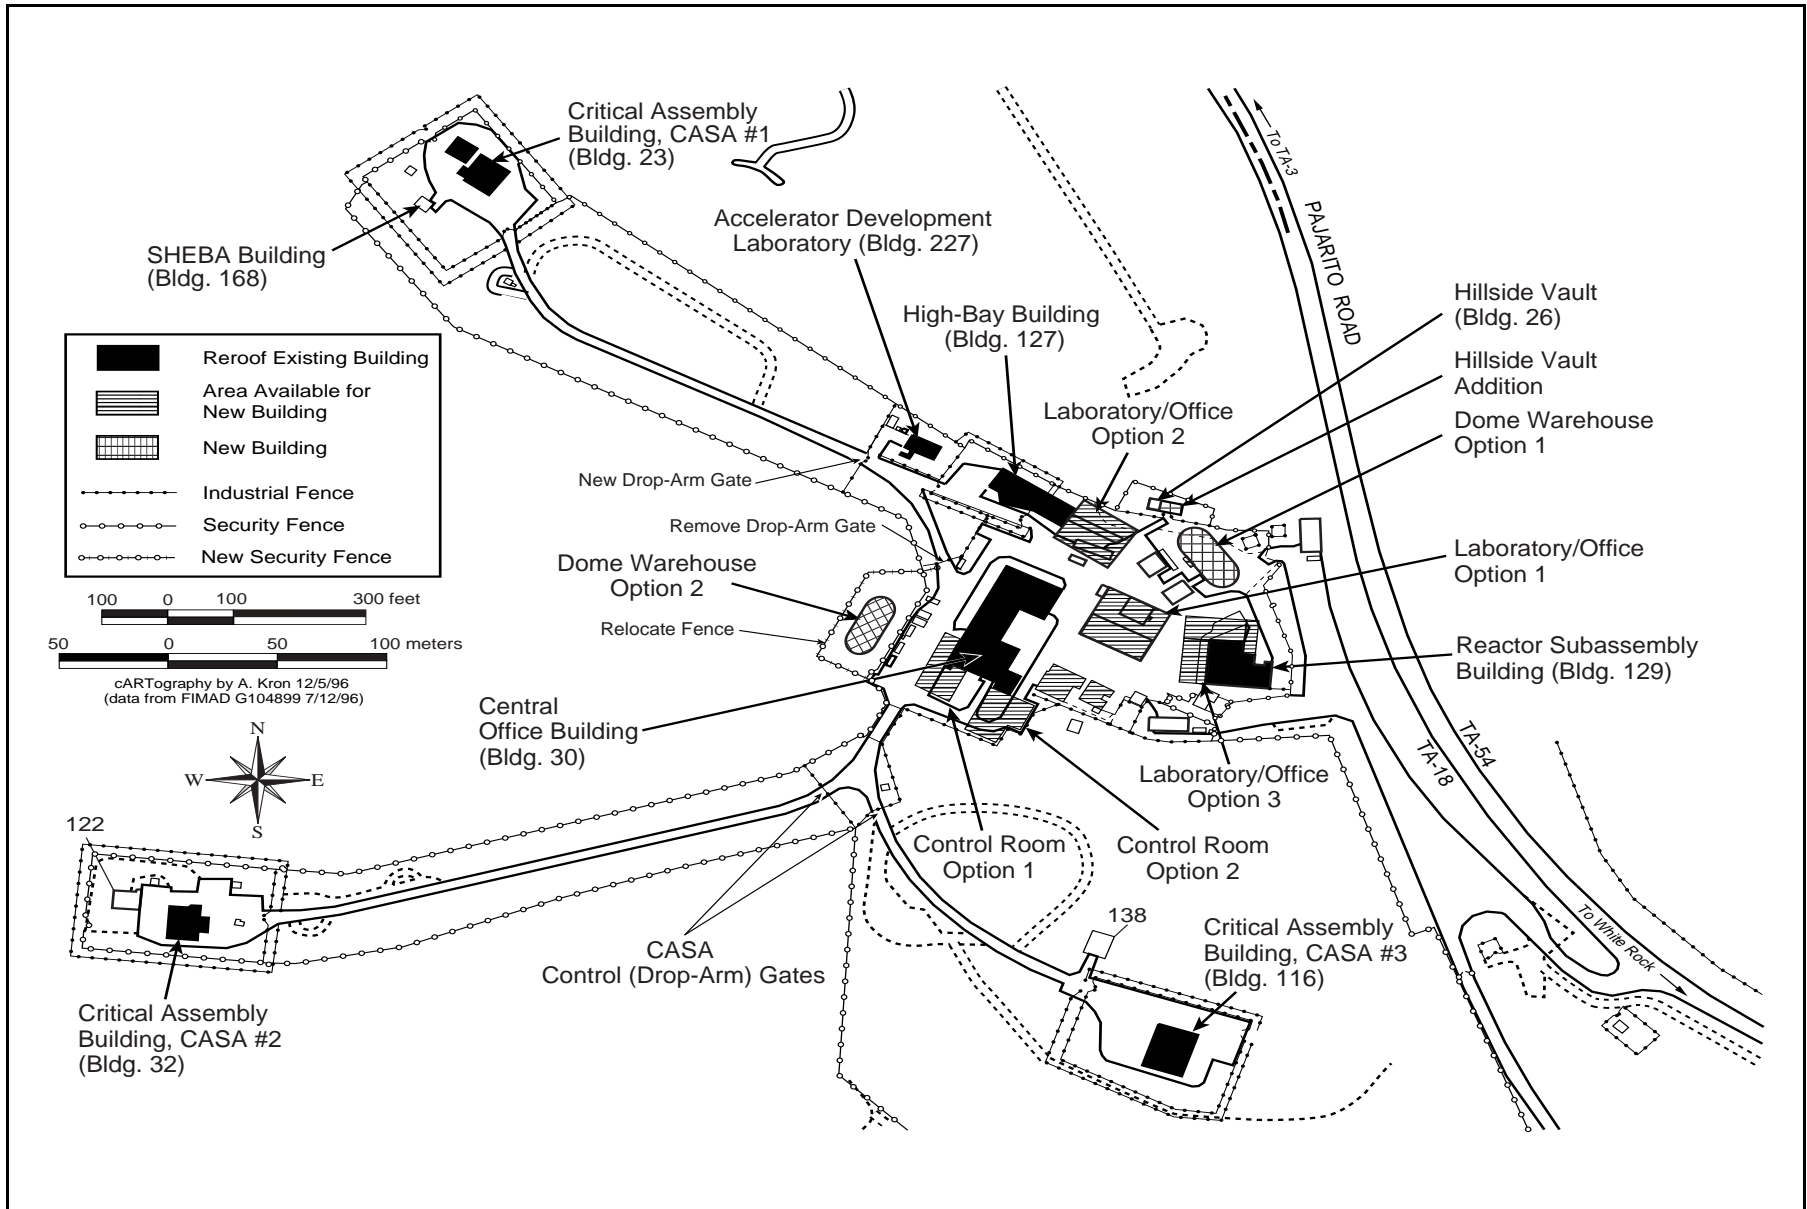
TA-18 Proposed Modifications Plan (TA-18 Upgrade Alternative)
